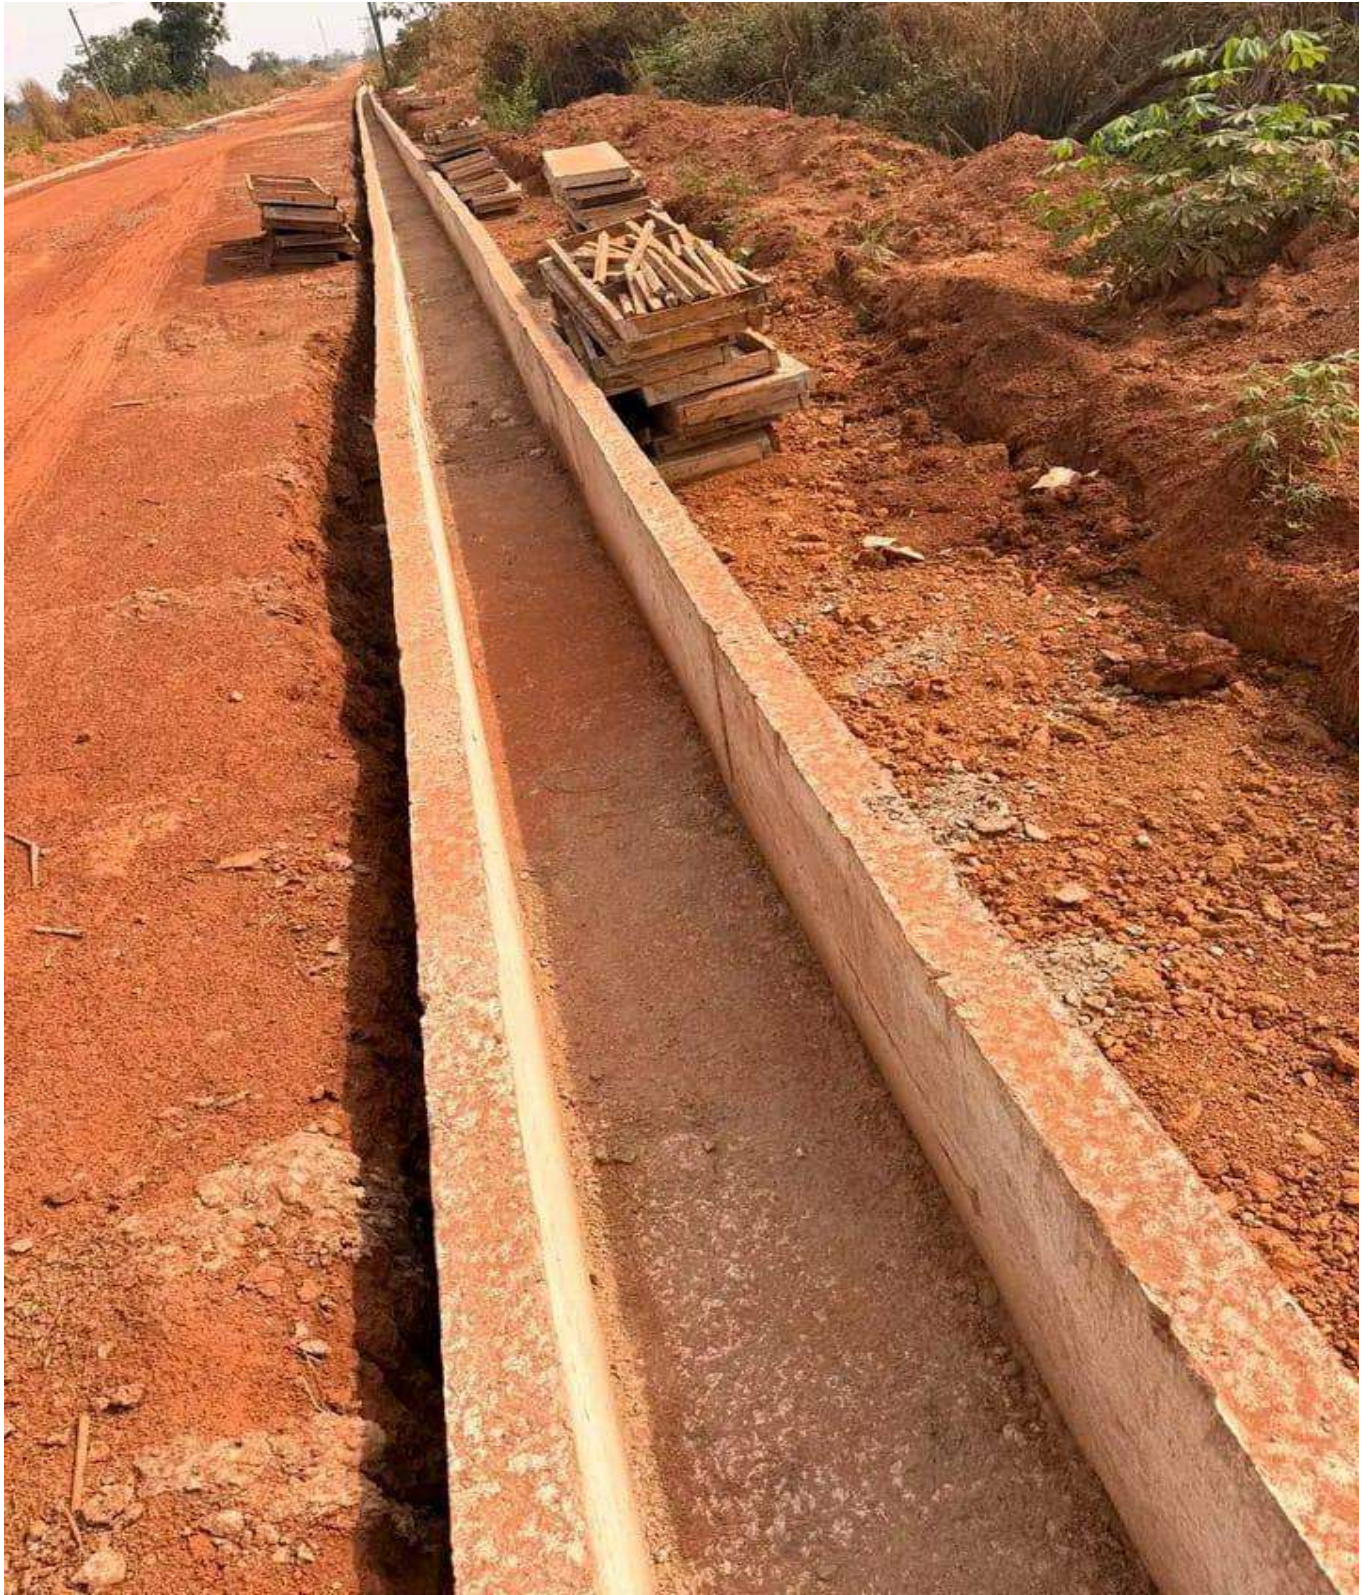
Construction of 17.1km Isu-orieagu -obeagu, ezzagu Road (15cm Rigid pavement thickness and Hydraulic structures) Onicha LGA
